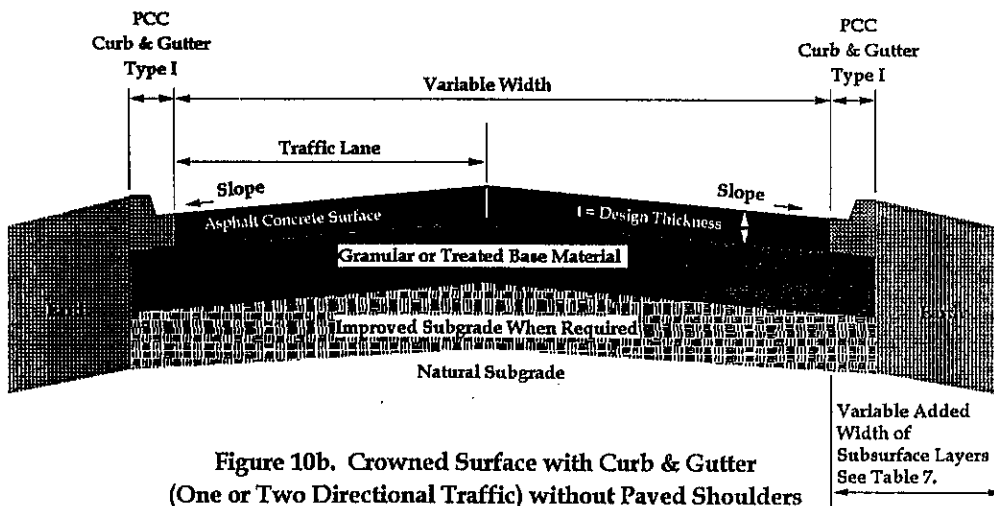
Crowned surface with curb & gutter (one or two directional traffic).
